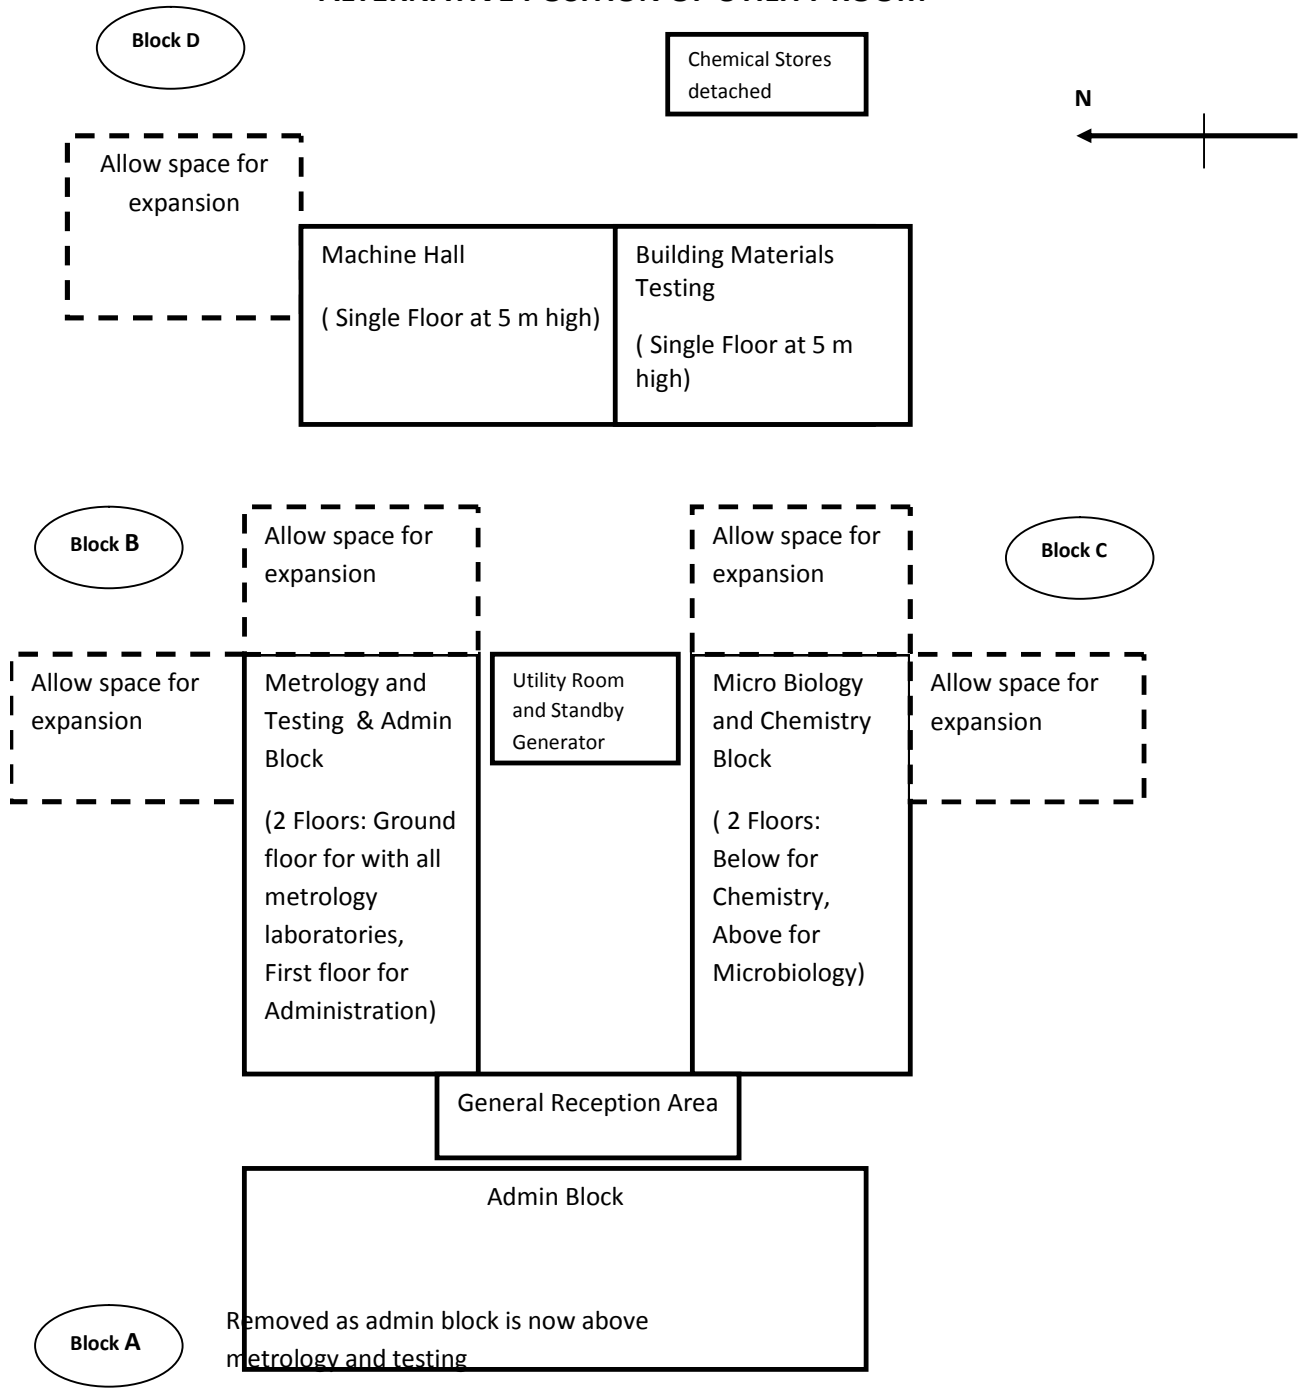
CONFIGURATION 1d (Details): LOCATION OF LABORATORIES ON GROUND/ LOWER FLOOR
